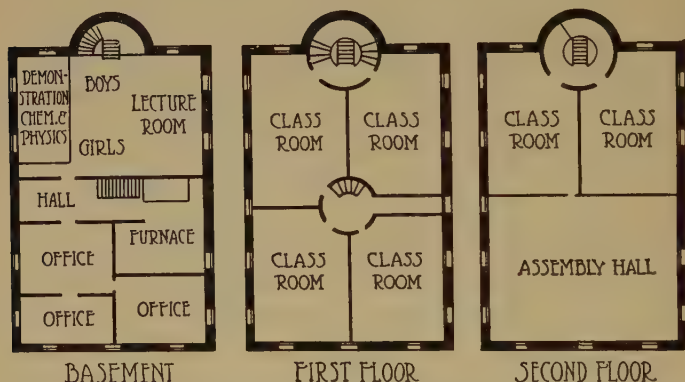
Floor plan of the Providence (Rhode Island) High School (1848)
